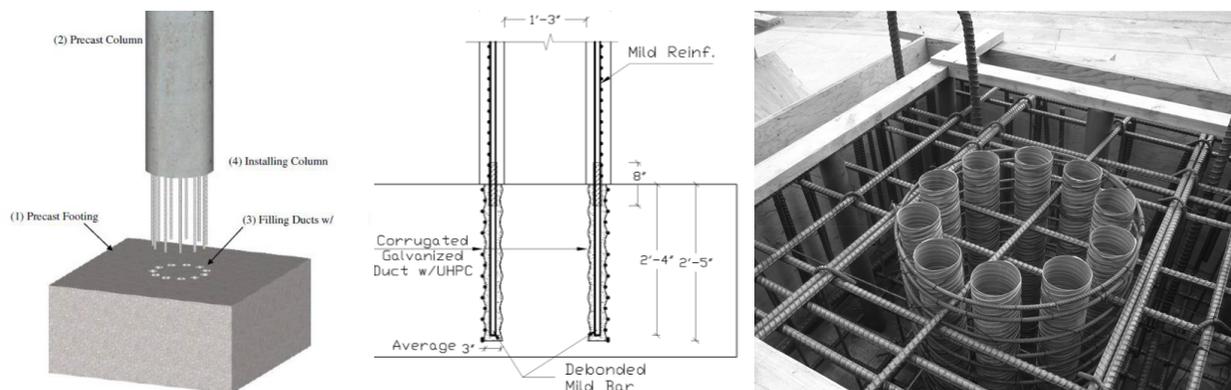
Typical grouted duct base connection and view of ducts and footing detail before concrete casting and column plunging (adopted from Tazarv and Saiidi 2015)
